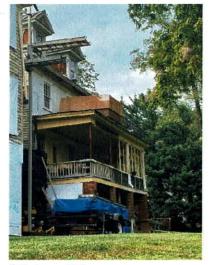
Shows faulty structual supports, inadequate roofing, and exposure to the elements)
